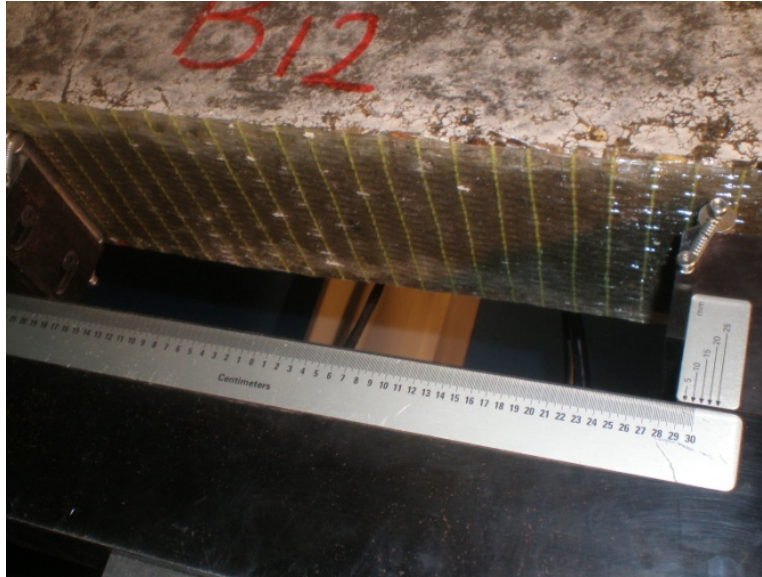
Fyfe GFRP strengthened beam specimen B12
